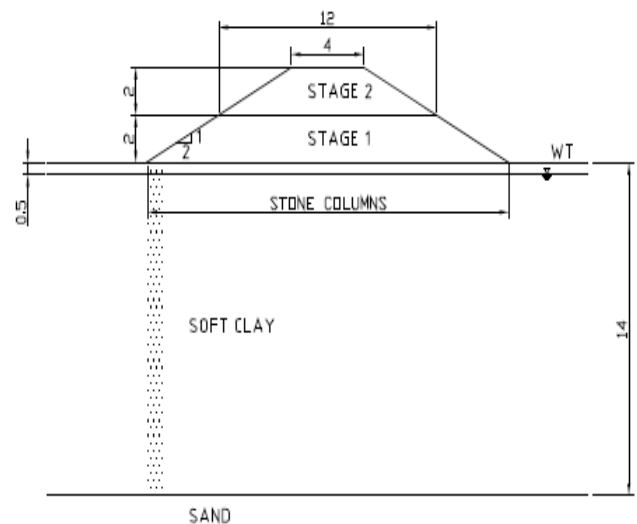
Geometry of the embankment over stone column treated ground, all dimensions in m (after Oh *et al.* 2007)
